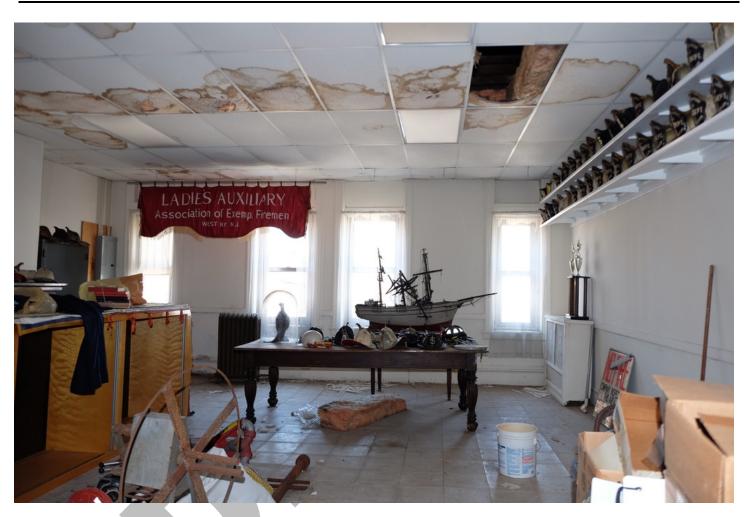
Interior - Second floor meeting room. View facing west towards Polk Street
